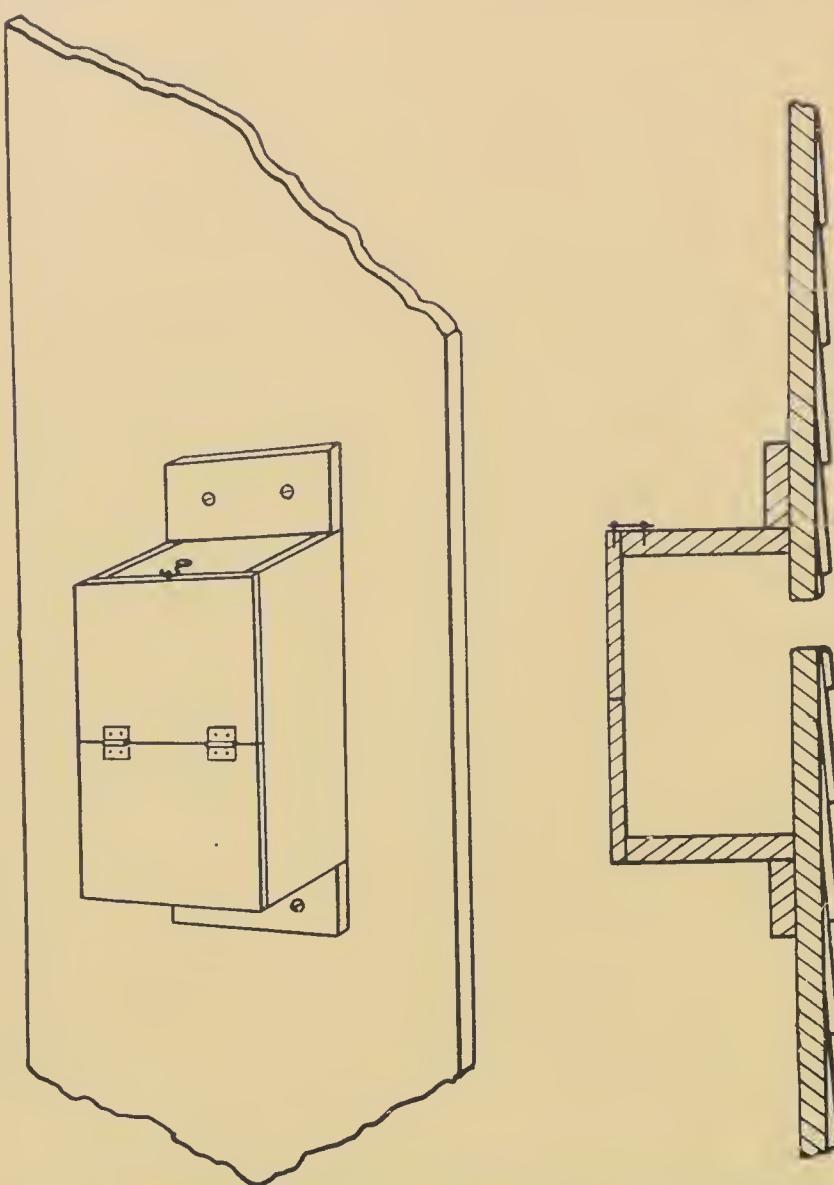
Perspective and sectional drawings of an improvised nesting box for the interior of buildings.
